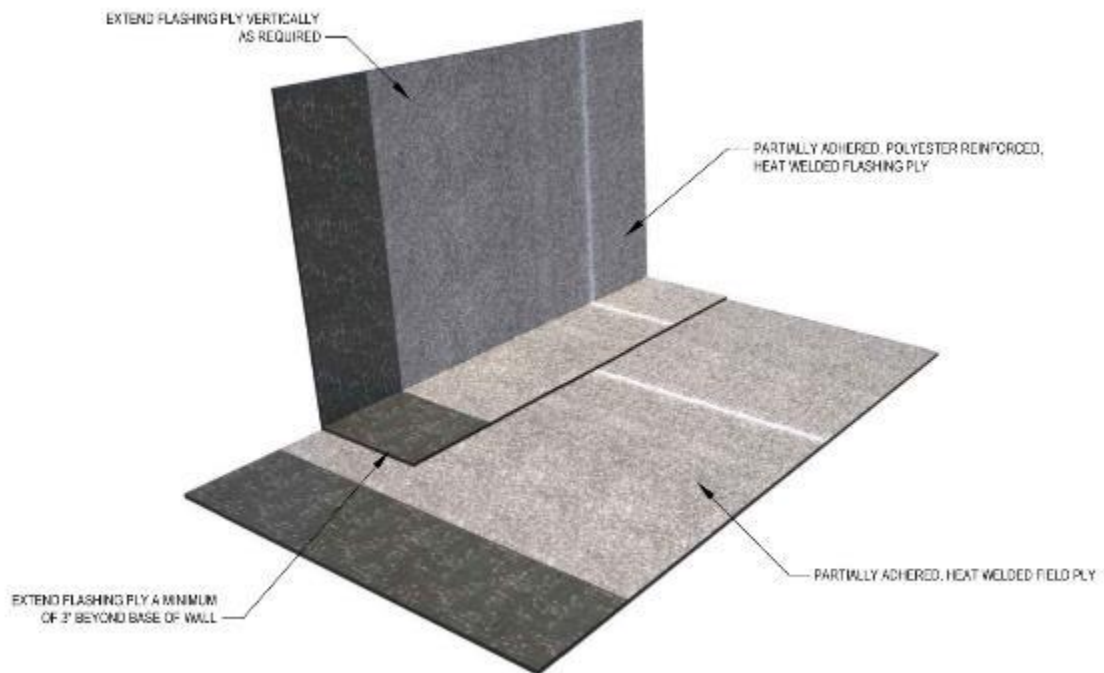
Partially Adhered, Heat Welded Vapor Retarder Flashing at Wall/Curb Without Cant
